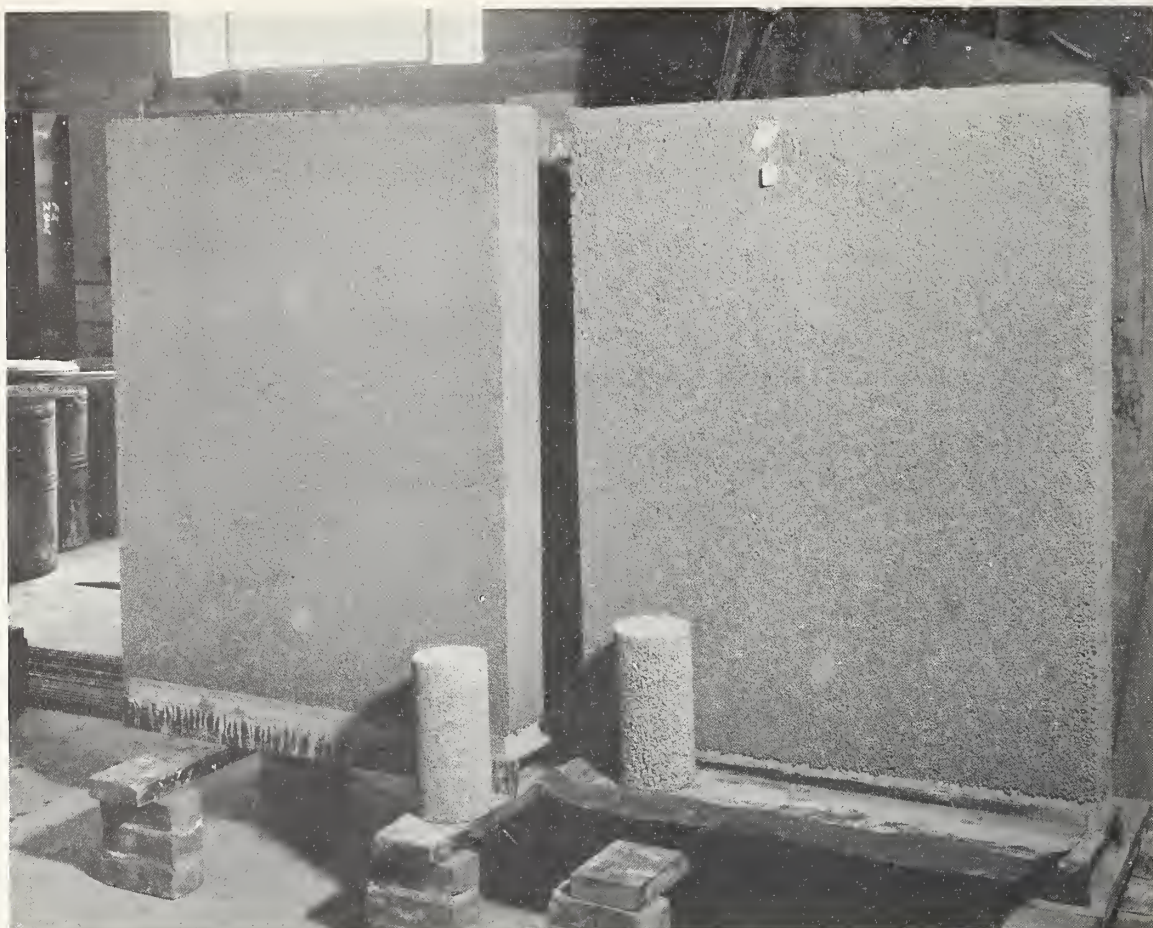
Water permeability specimens of porous concrete containing grits and before stuccoing.
